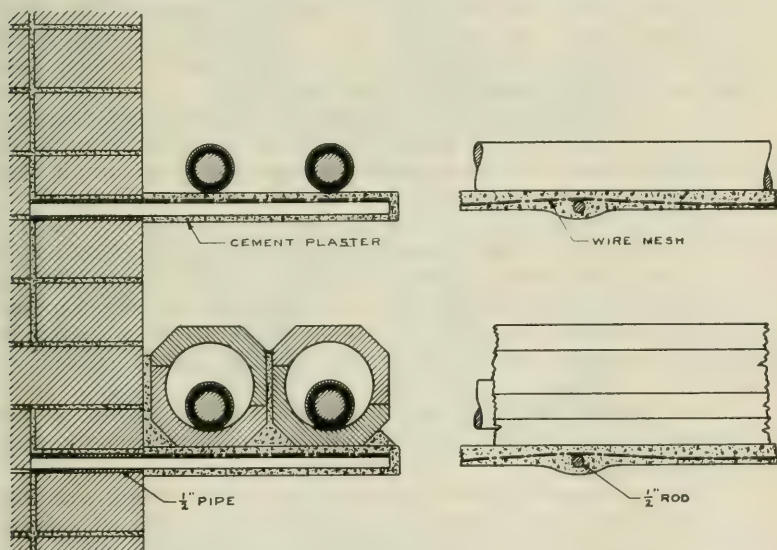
Concrete Shelves in Manholes Also Serving as Barriers. Lower Shelf Equipped with Split Duct.
